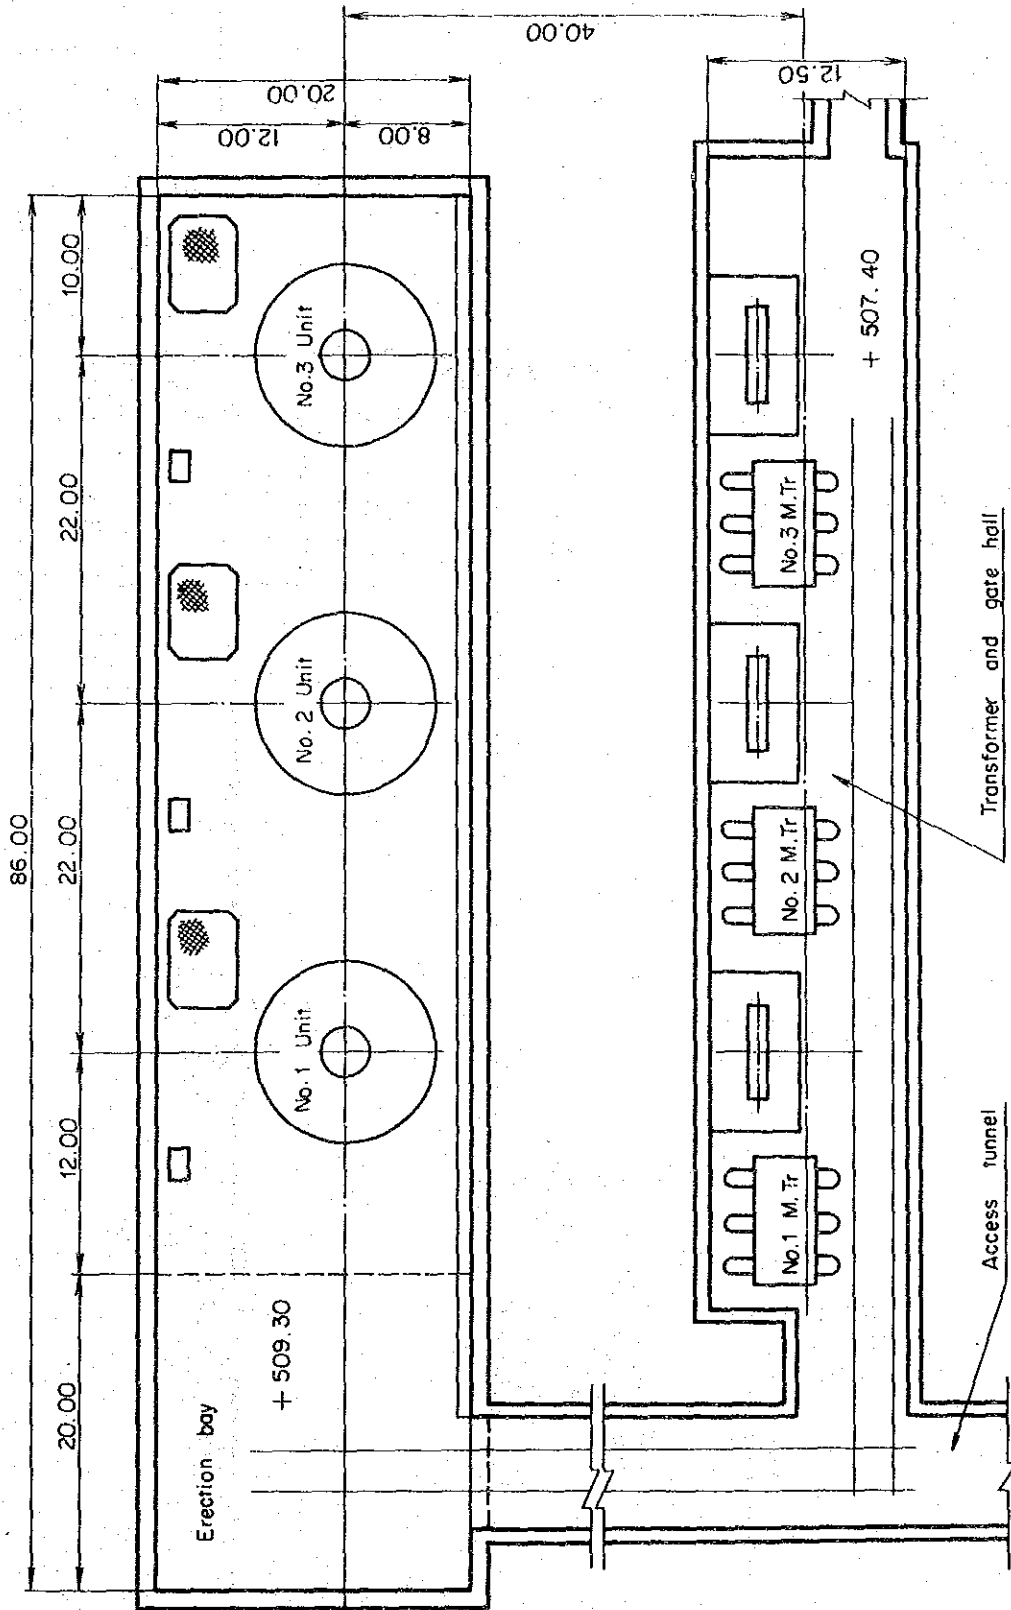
Plan of Power Plant (Yusufeli Project)
